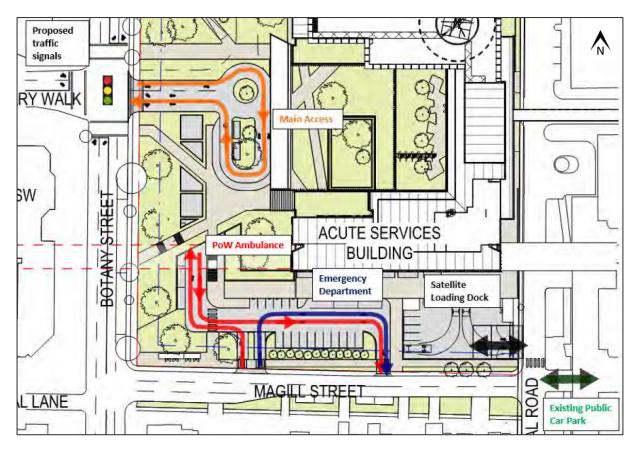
| Proposed site entrances (Source: Applicant's EIS)
